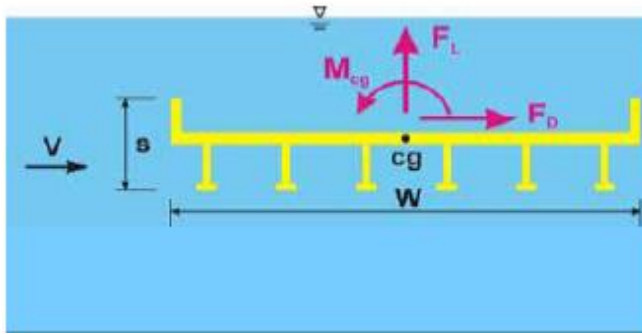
An illustration of the forces acting on the bridge deck. (FHWA, 2009).
